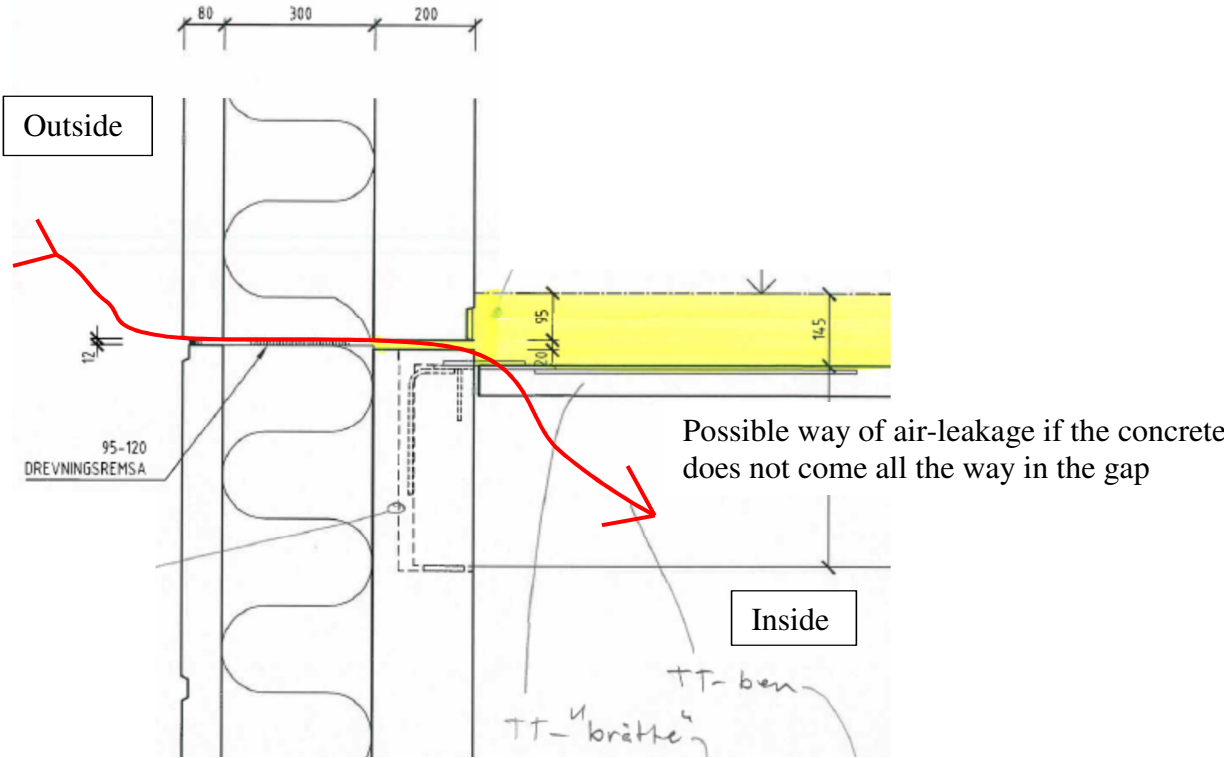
Outer wall construction drawing with possible air leaks in the gap between concrete elements
